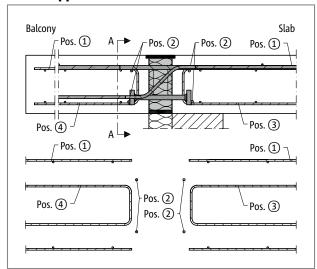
Schöck Isokorb® T type K-M12: On-site reinforcement with direct support
